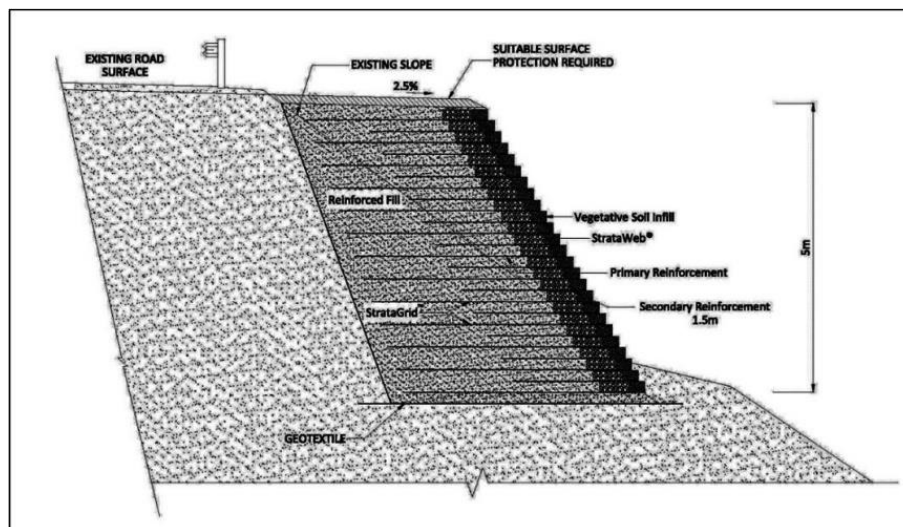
Cross section of 5m high reinforced soil structure with geocell fascia
